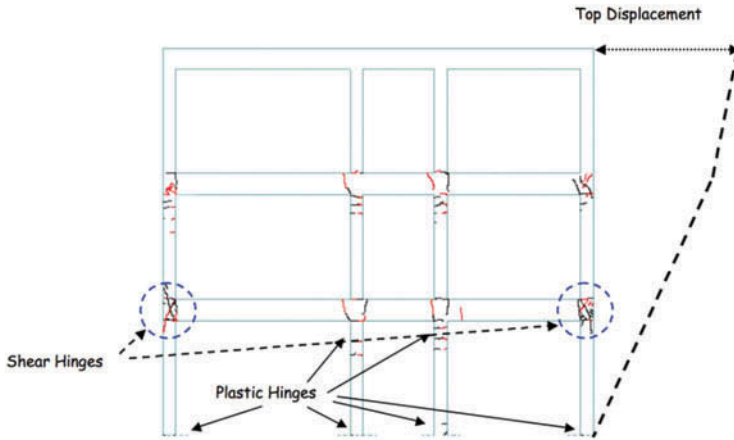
Crack damage reported by Calvi et al. [2002b] at a roof drift of 1.6%.
